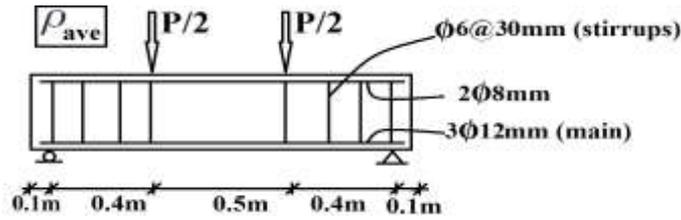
Reinforcement, geometry and loading of the beam 2P-ave
